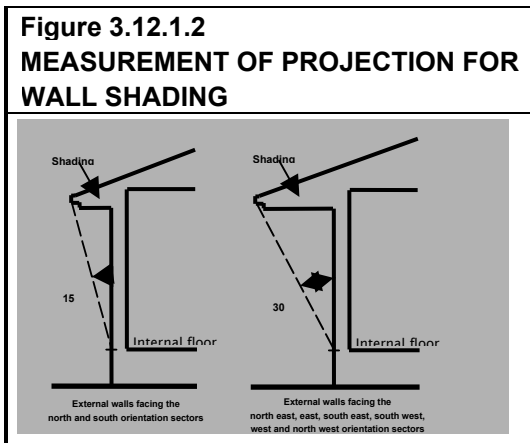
Minimum wall shading required to avoid the use of wall insulation in hot climates
